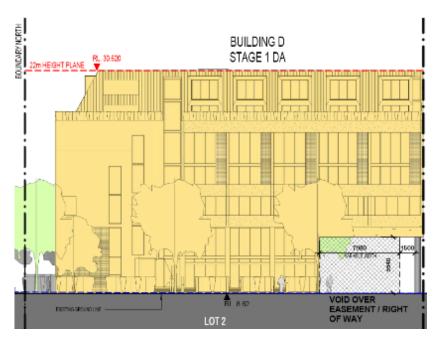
Elevation of building D with upper levels extended over the proposed $\ \mathsf{ROC}$
